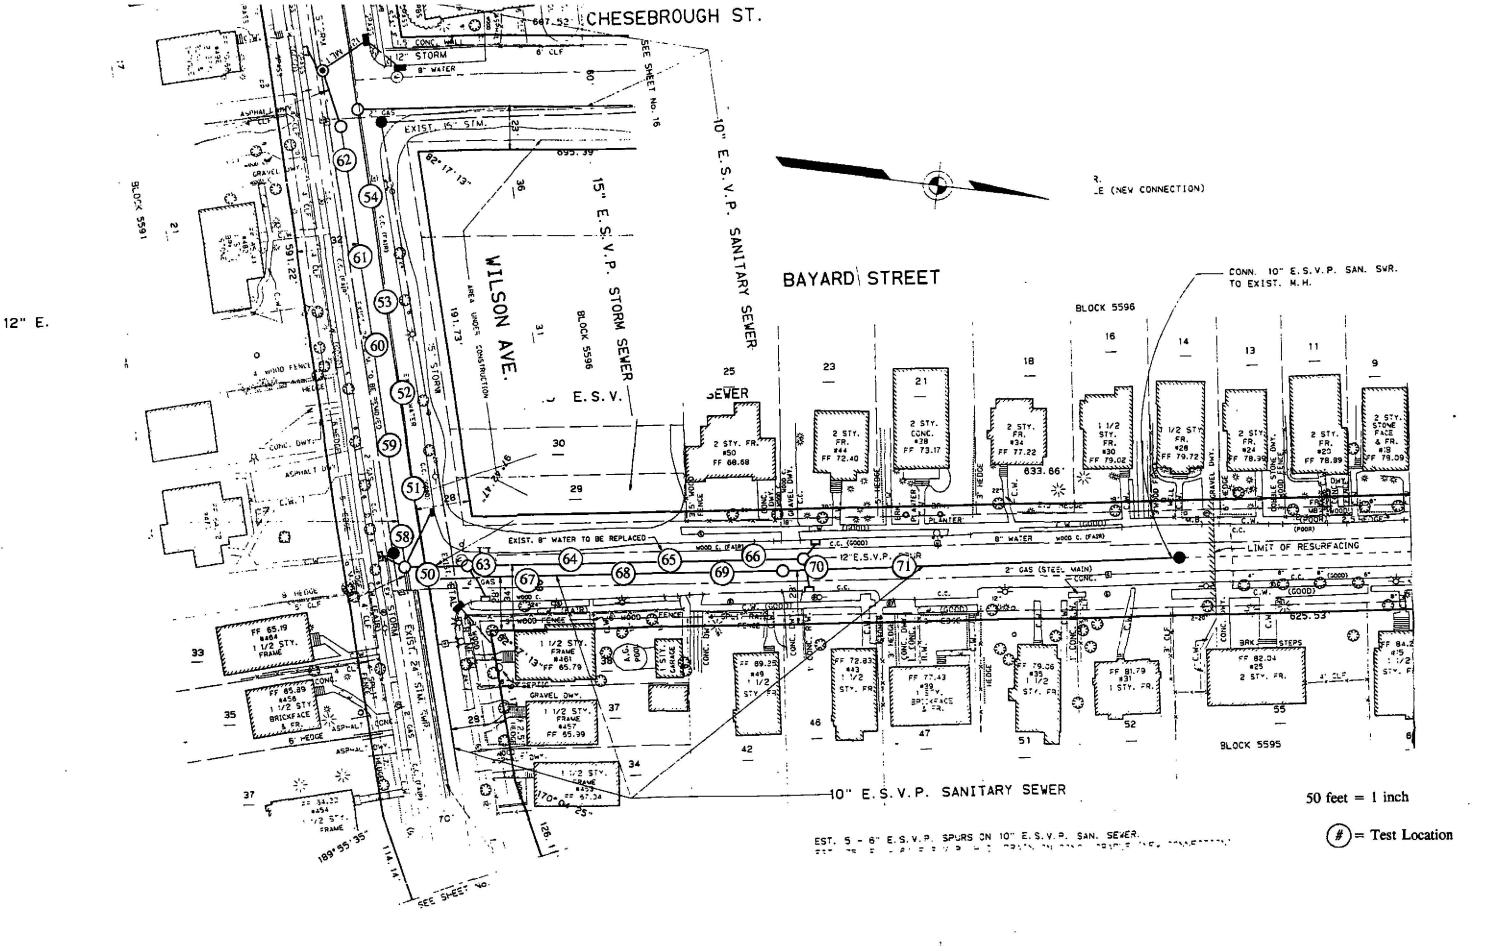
Planned Phase 1B shovel test locations on Wilson Avenue and Bayard Street.
